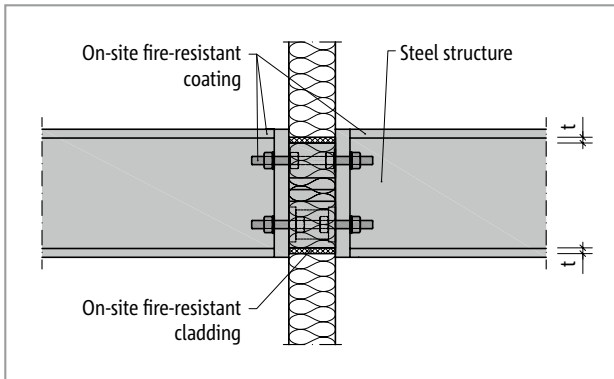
Fire protection Schöck Isokorb® T type S: On-site fire protection cladding T type S, fire protection coated steel structure; section
